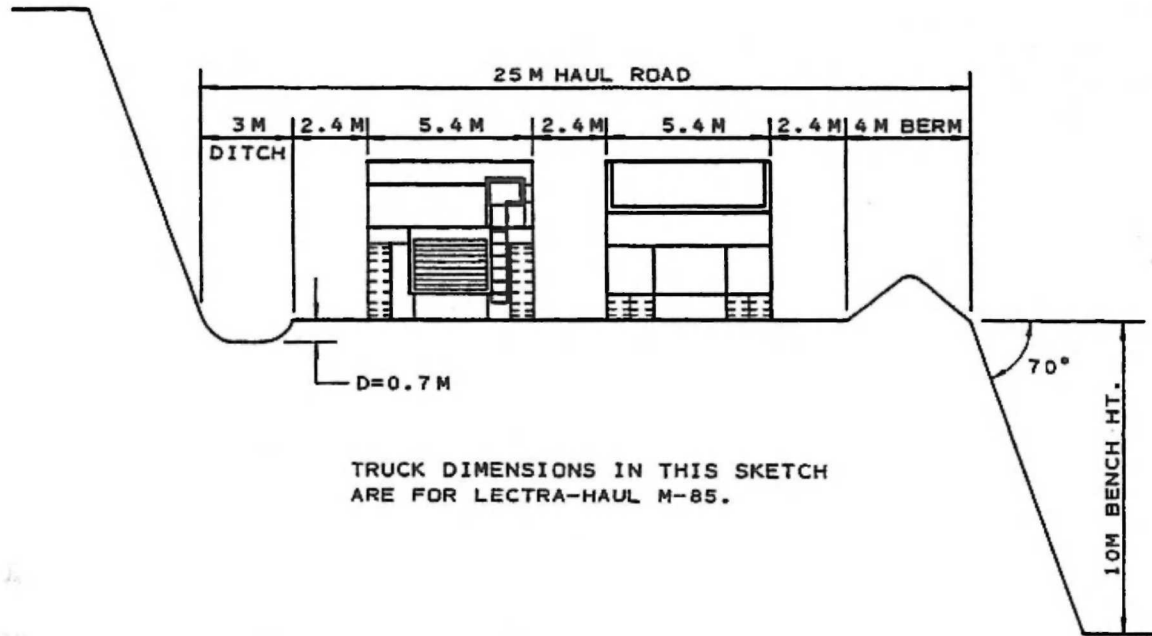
Typical design haulroad width for two-way traffic using 85 st capacity trucks (Couzens, 1979).
